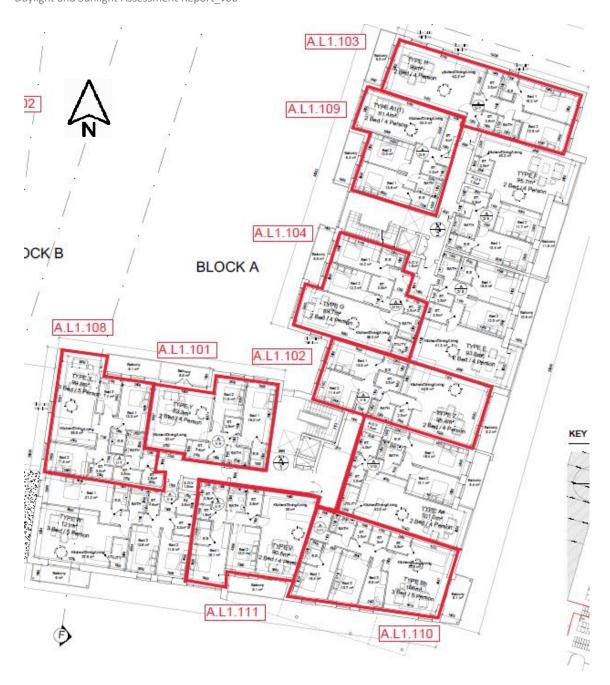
Floor Layout of the Proposed Scheme Block A – First Floor
